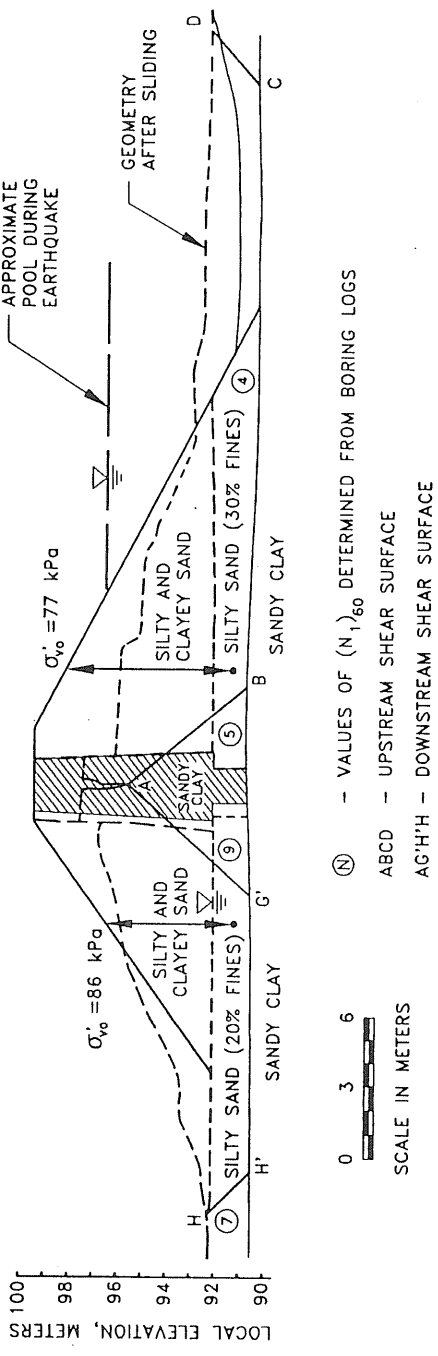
Reconstructed Cross Section through Failed Portion of La Marquesa Embankment [from De Alba et al. (1987)]
